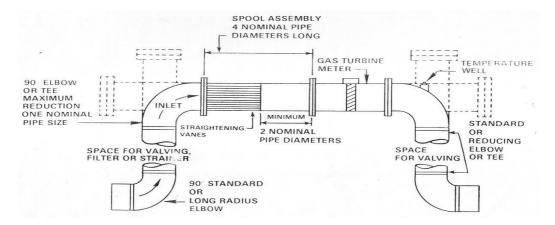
Short coupled installation of an in-line gas turbine meter (Minimum Length)
